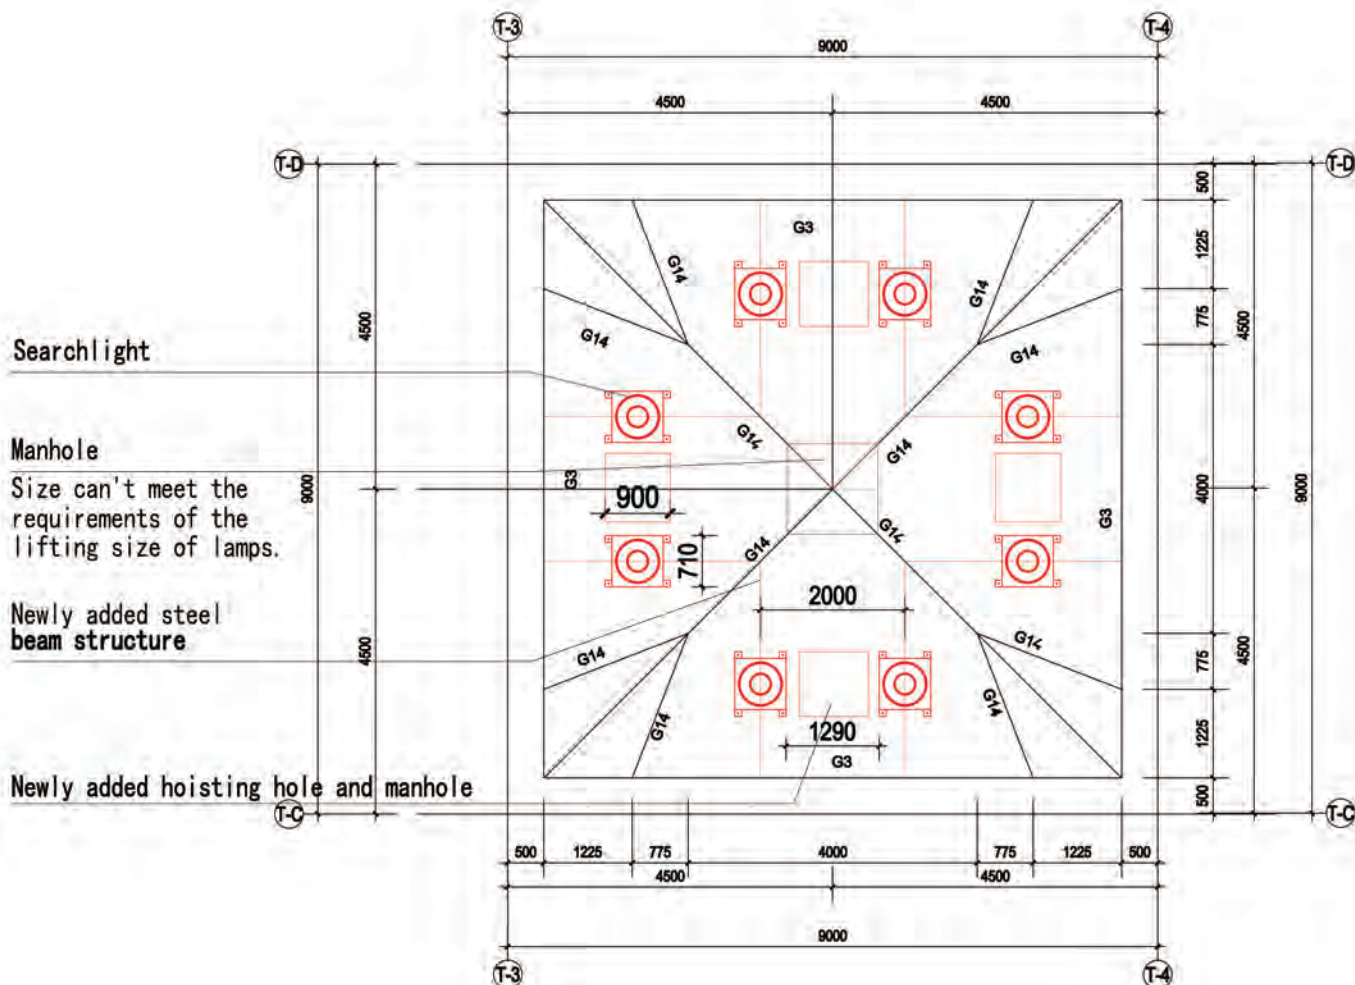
Structure adjustment diagram of the installation position at the top of the tower (Source: Beijing Fortune Lighting System Engineering Co., Ltd.)
